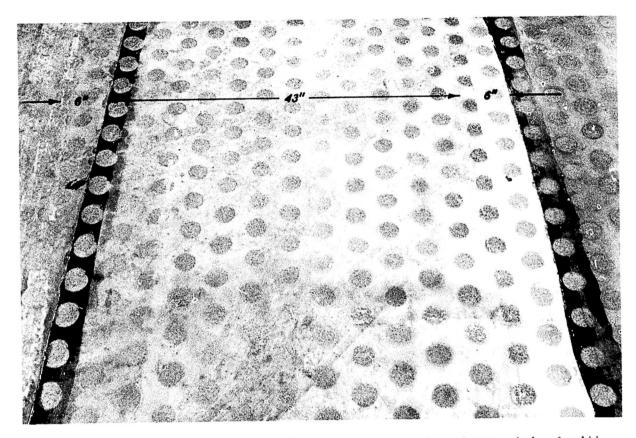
Nonskid-treated 55-in.-wide run of membrane joined with 6-in.-wide single-lap adhesive joints.
